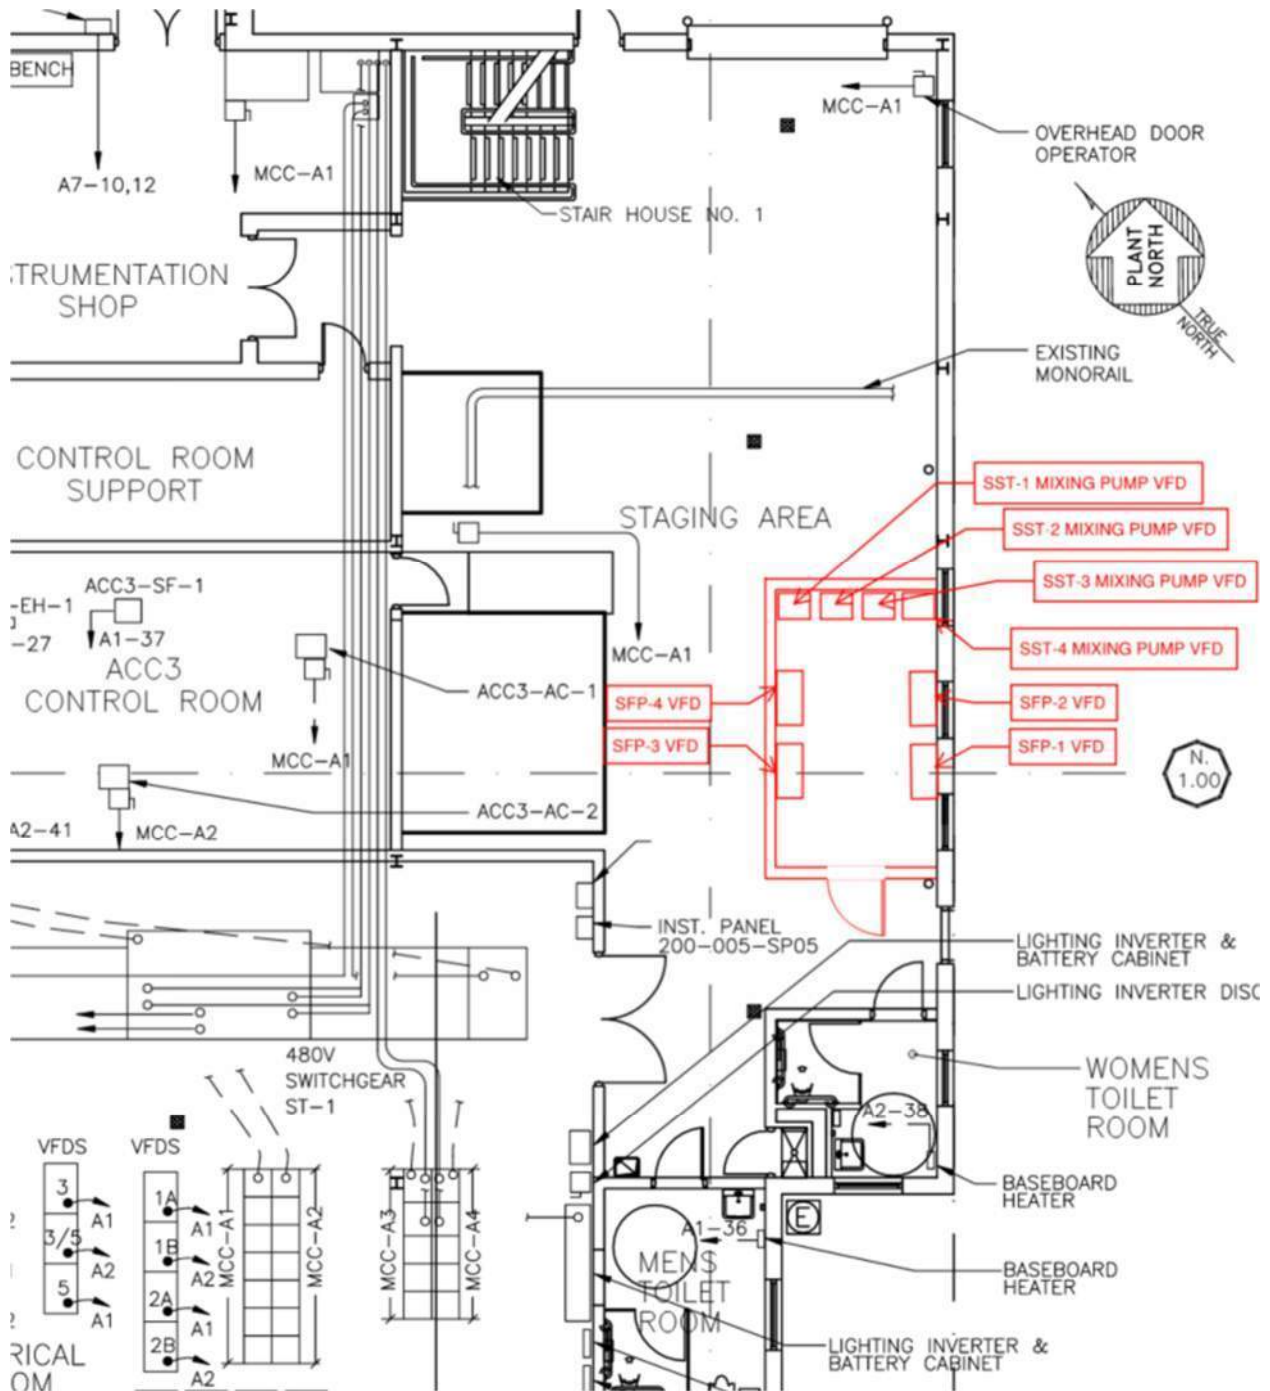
Alt-C1 Electrical Room Layout in Sludge Processing Complex A Storage Room
